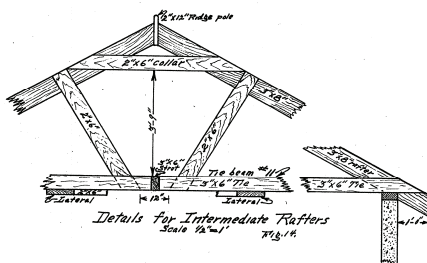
Detail of intermediate rafters from 1921 "Boat House Reinforcing & Roof Detail" drawings.
